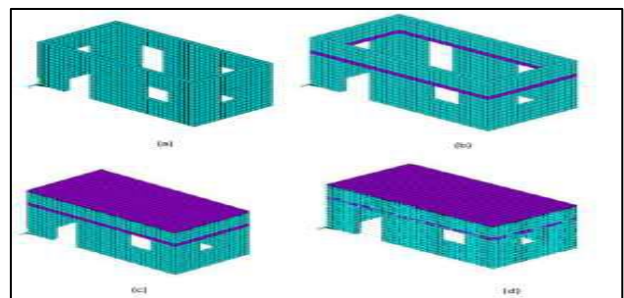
Configurations of URM buildings (a) U (b) UL (c)ULR (d) ULRC type [8]
